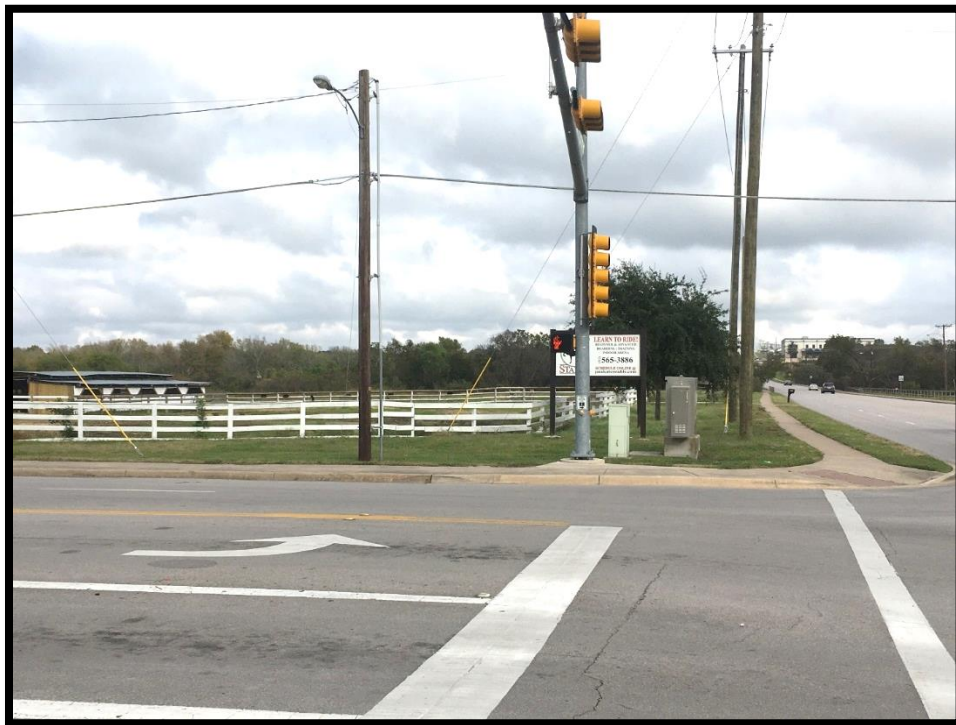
Facing north toward Round Rock Ranch Boulevard roadway and the Round Rock Ranch subdivision.
